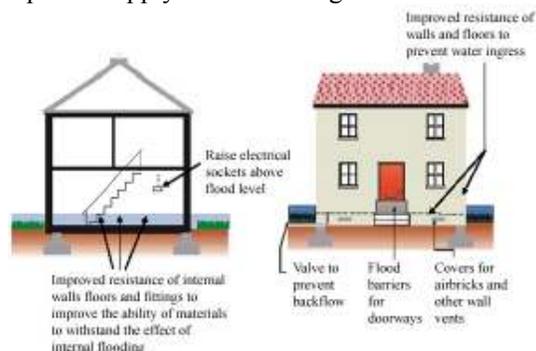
Construction techniques for flood resistant buildings (Planning and Building Standards Advice on Flooding 2006)
